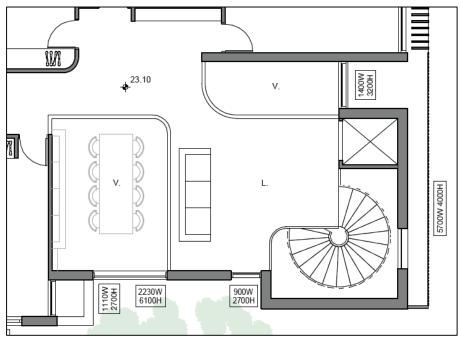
Void spaces above to the stairwell, foyer and dining room.
